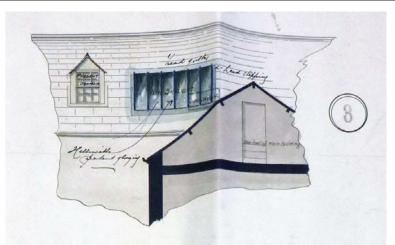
Section and elevation, dated 1903 (CAC(B) Z/1028/2 1901-1904)
